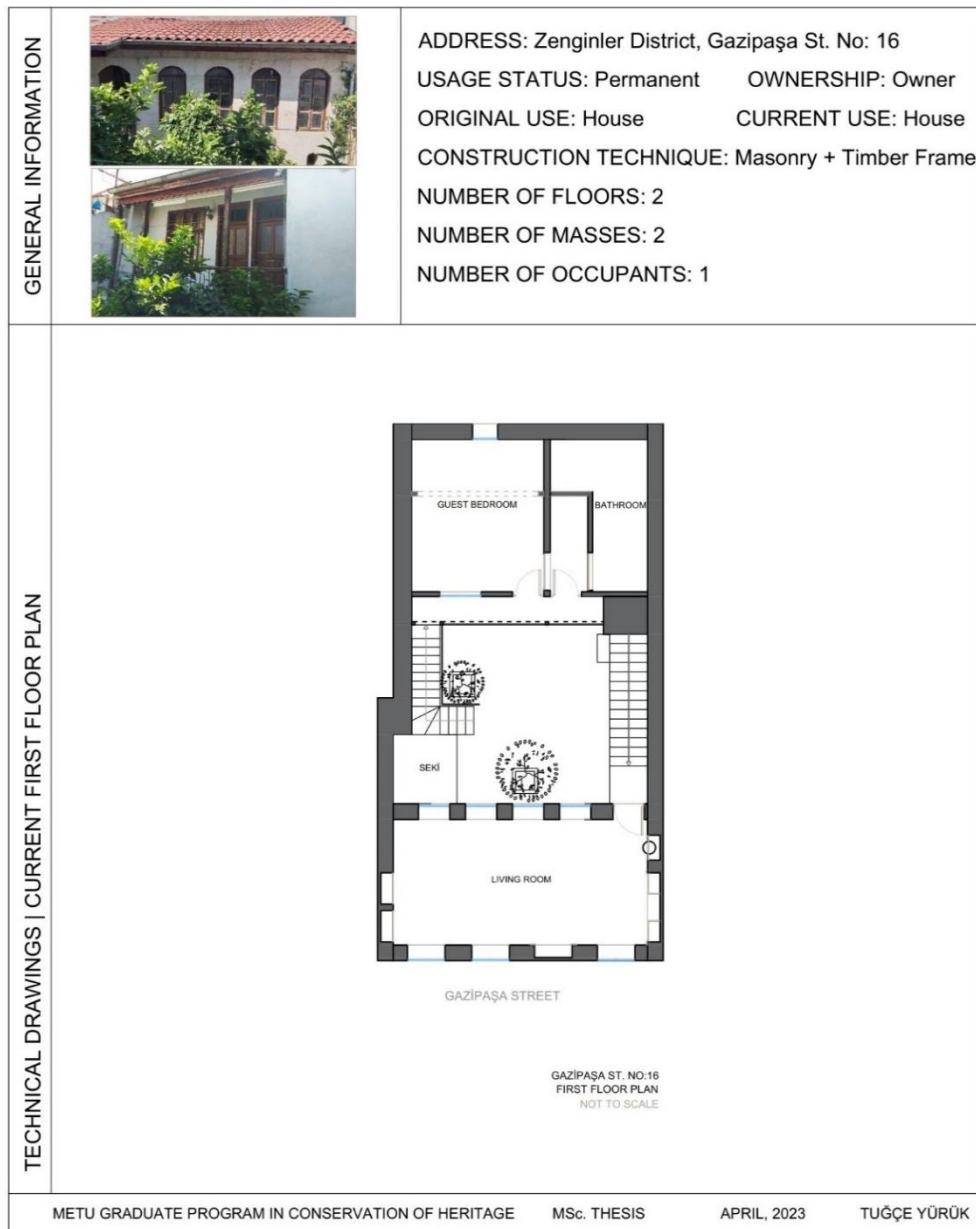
The first floor plan of Gazi-16 House (Author, 2023)
